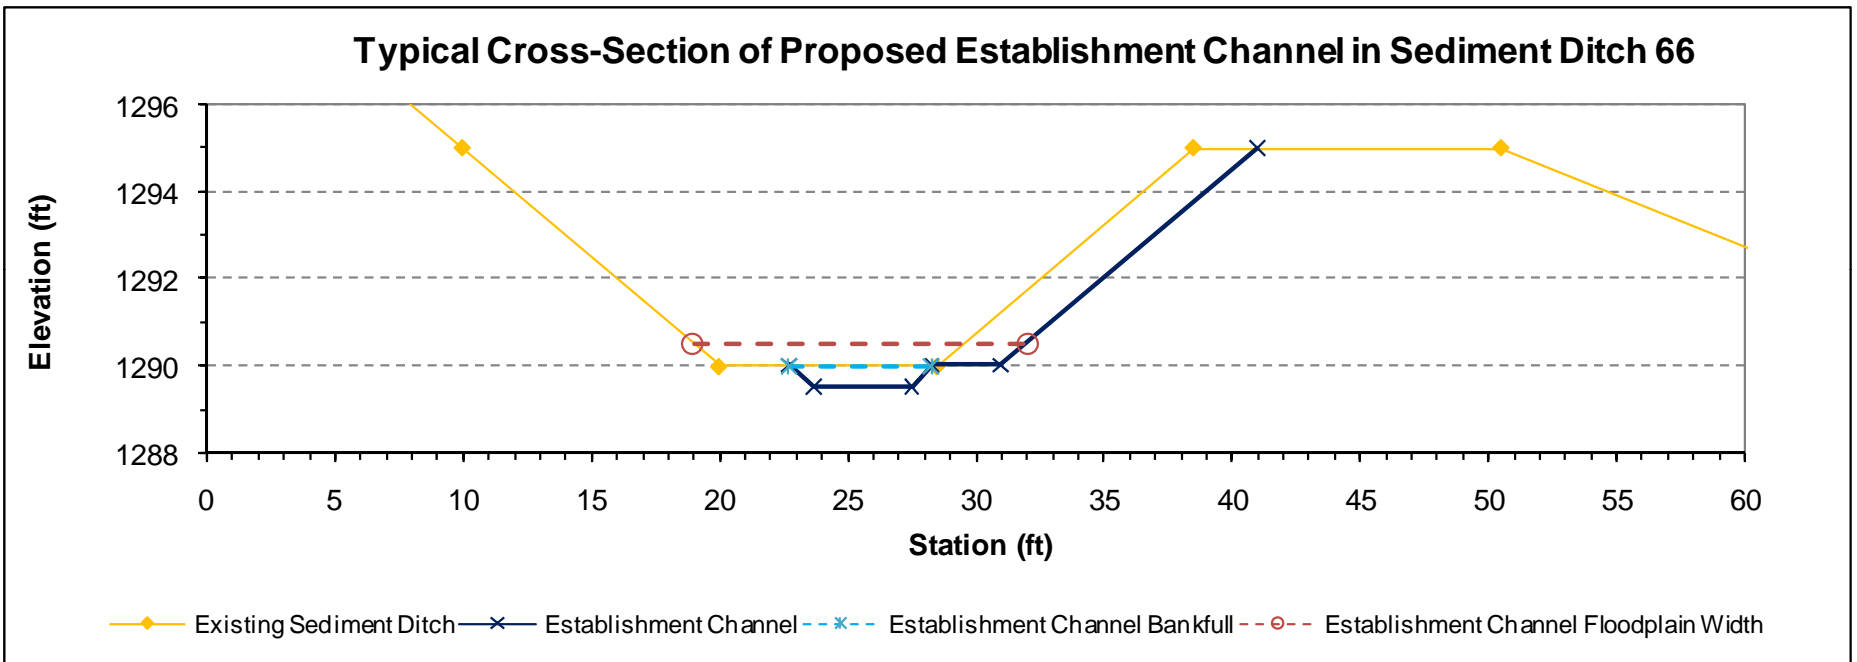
Typical Cross-Section of Proposed Establishment Channel in Sediment Ditch 66 (requires additional excavation for floodplain)
